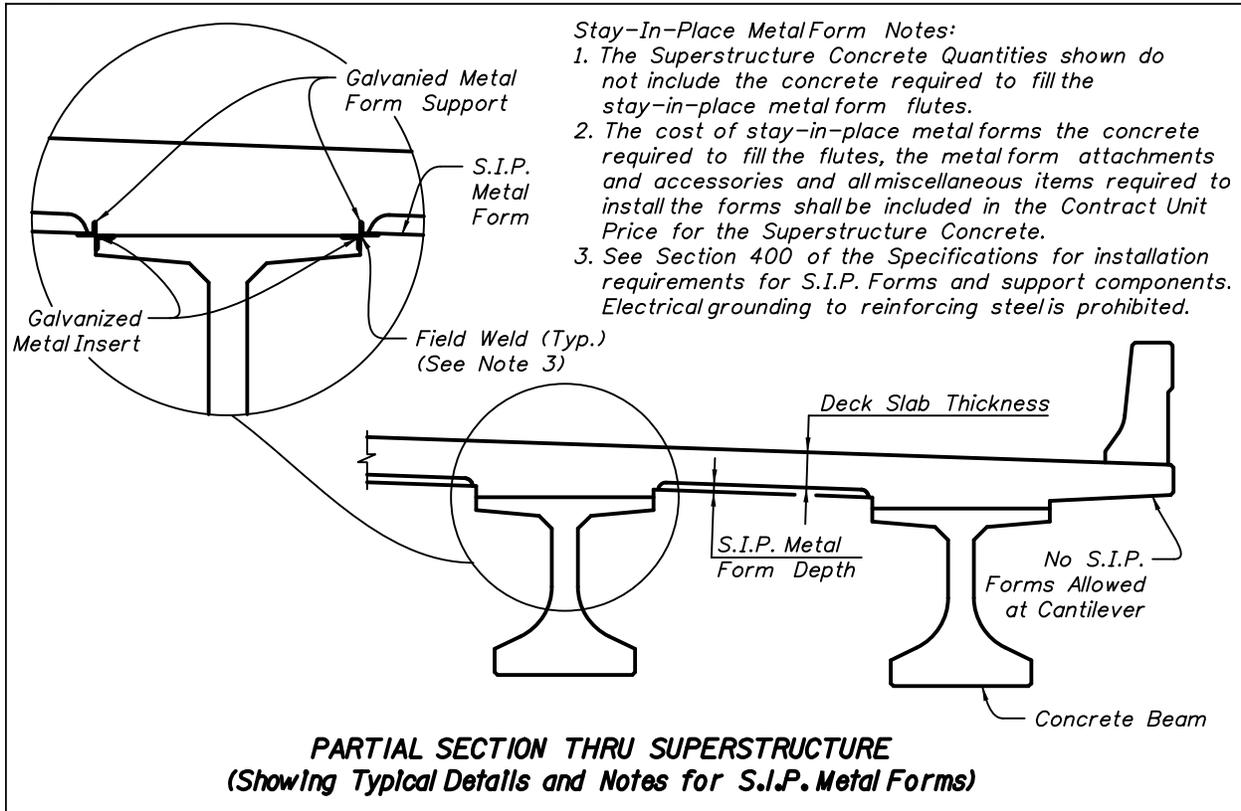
S.I.P. Form Details for Prestressed Concrete Beams
